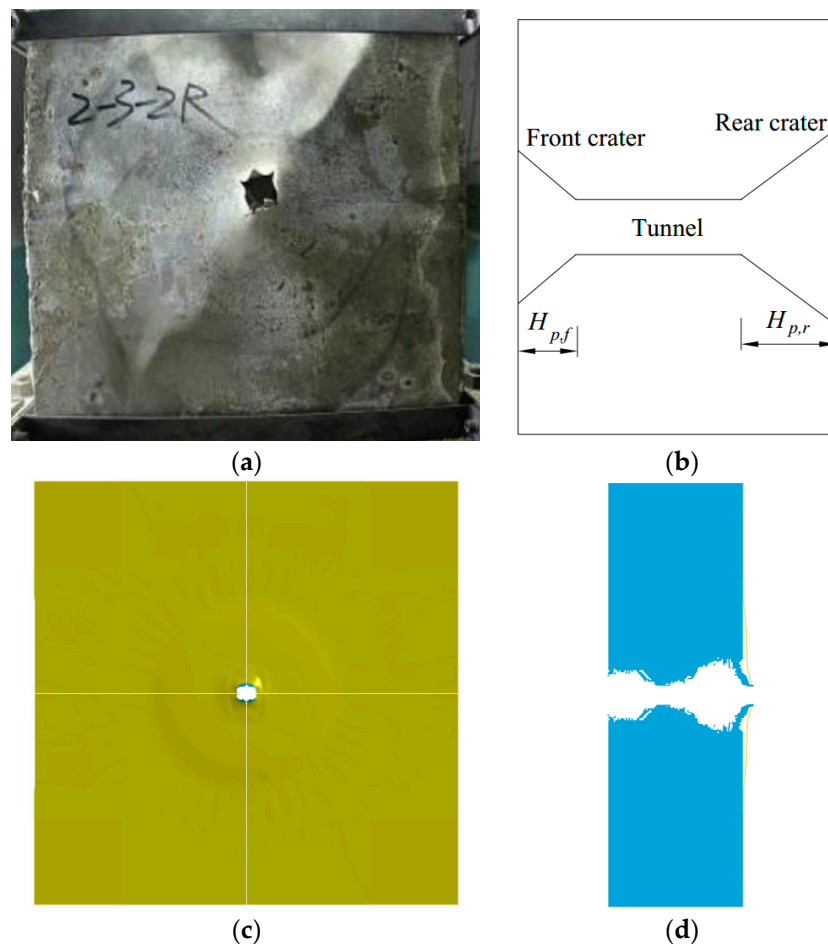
Damaged contour of SC walls. (a) Rear view of SC walls; (b) section view of concrete panel; (c) numerical results of damaged steel plate; (d) numerical results of damaged concrete panel.
